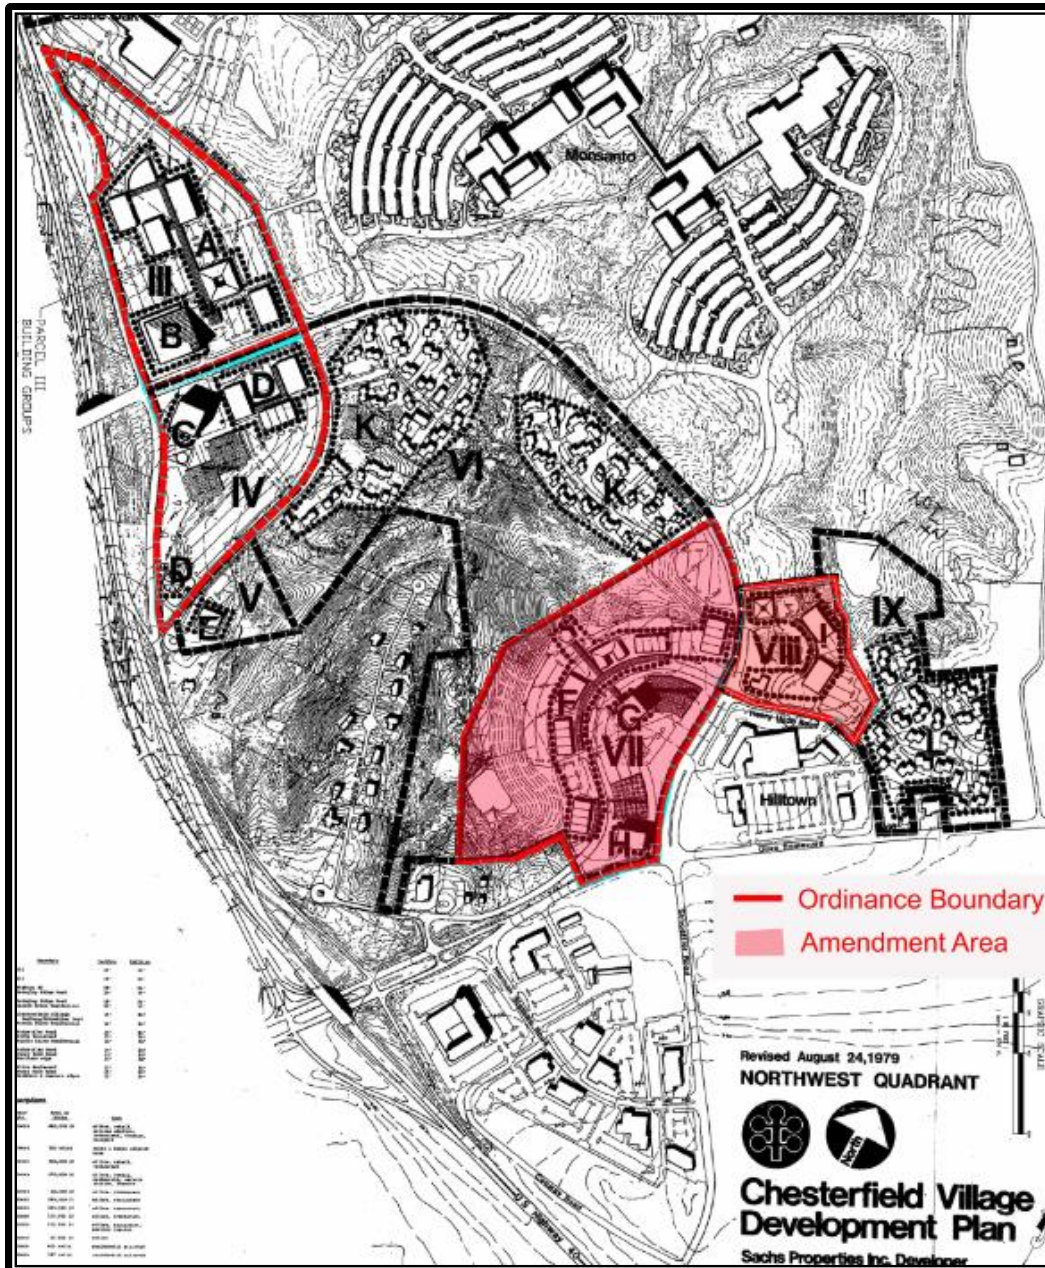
Chesterfield Village Development Plan with Ordinance Boundary and Subject Site
